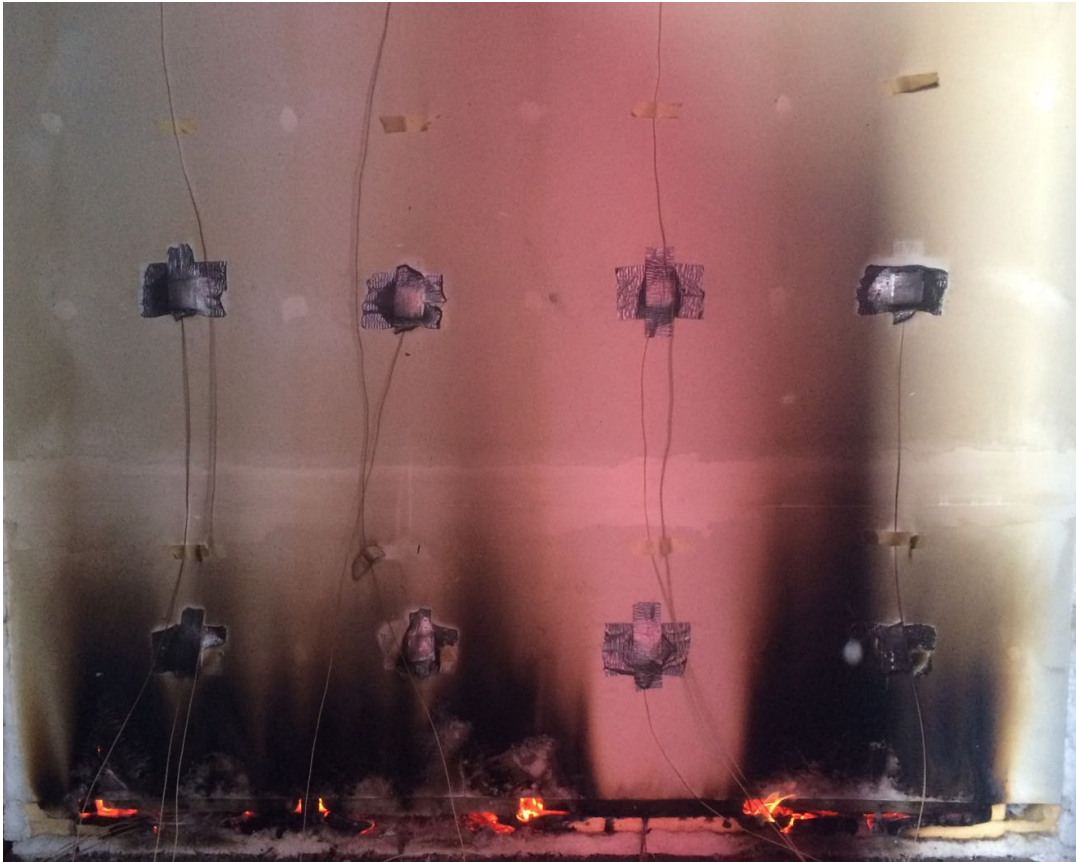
Real wall test #1, unexposed side of the wall, inadequate wallcovering.
